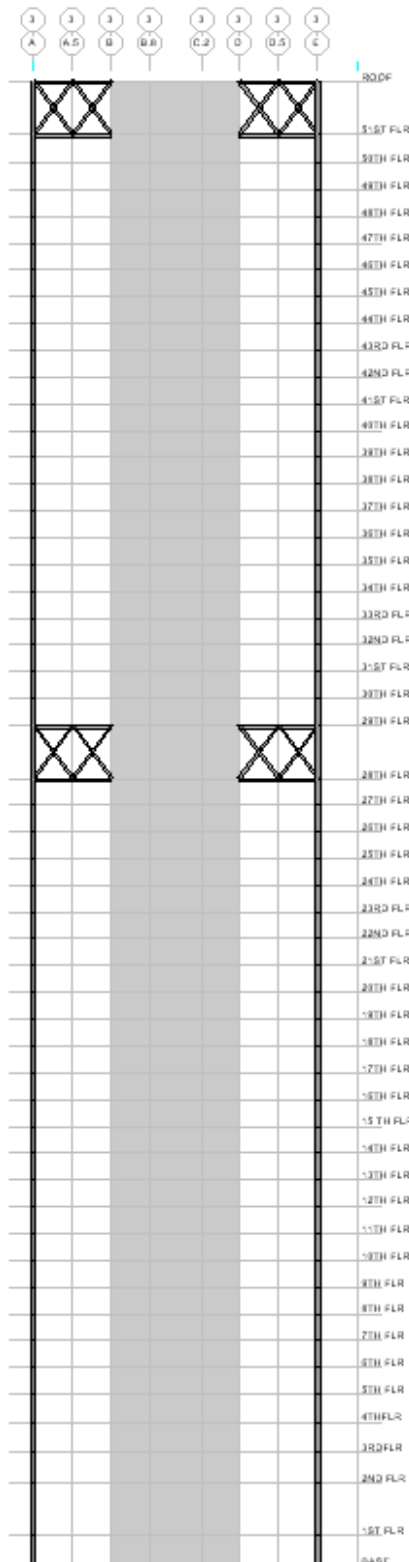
Alternative Lateral System Elevation (Grids 3 & 6)
